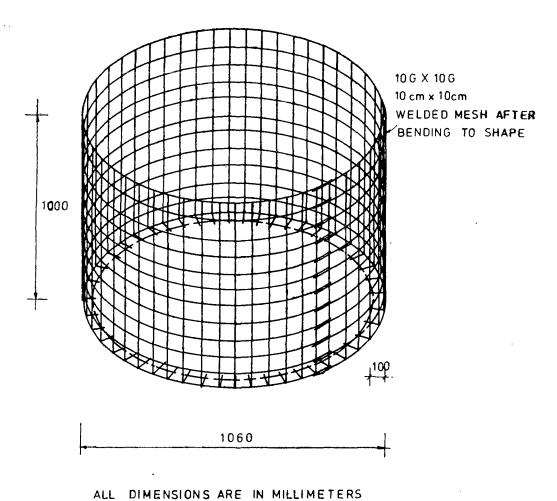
(b) Details of welded mesh for circular tanks (Type B)
